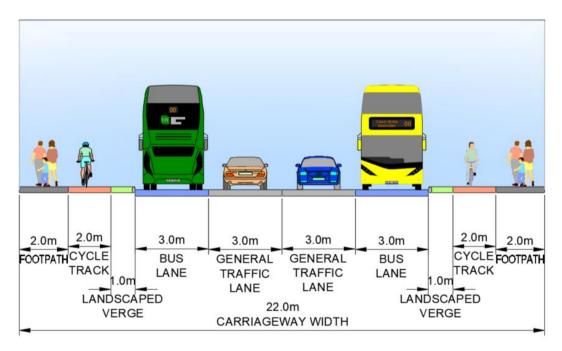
Section 2 Option 1 Indicative Cross Section
